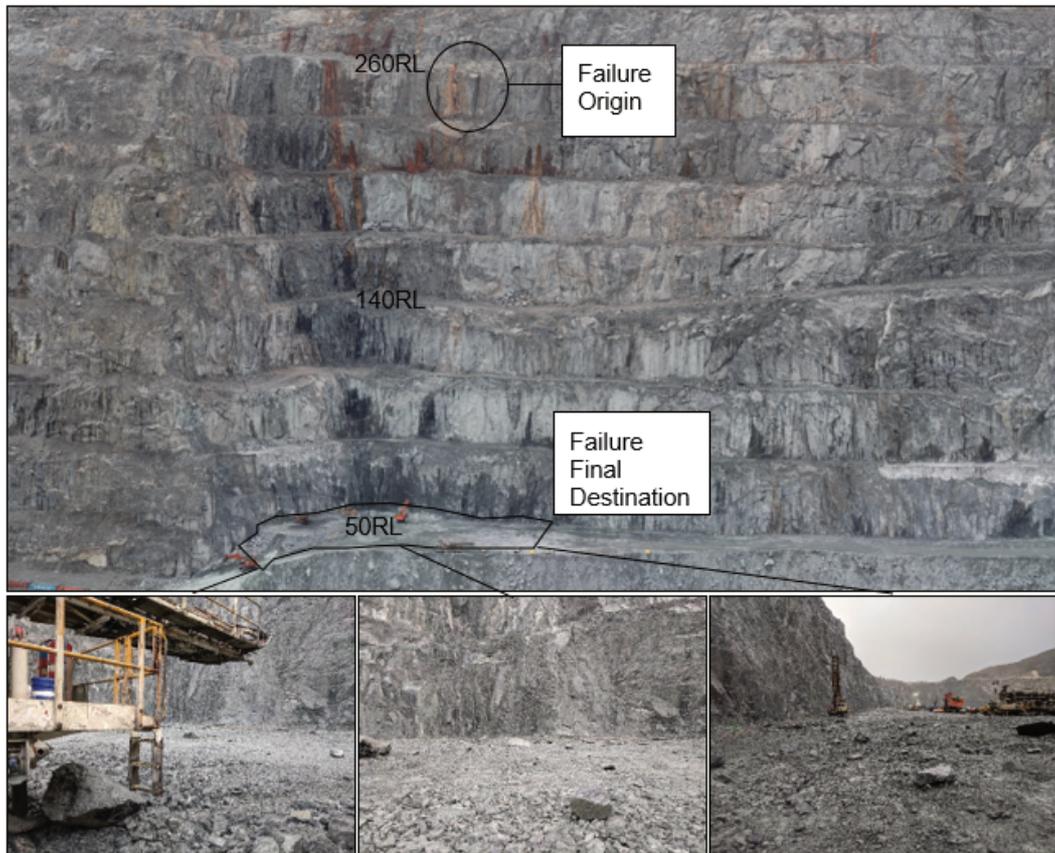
Photo showing failure location on the east wall of North Pit at Savage River Mine
